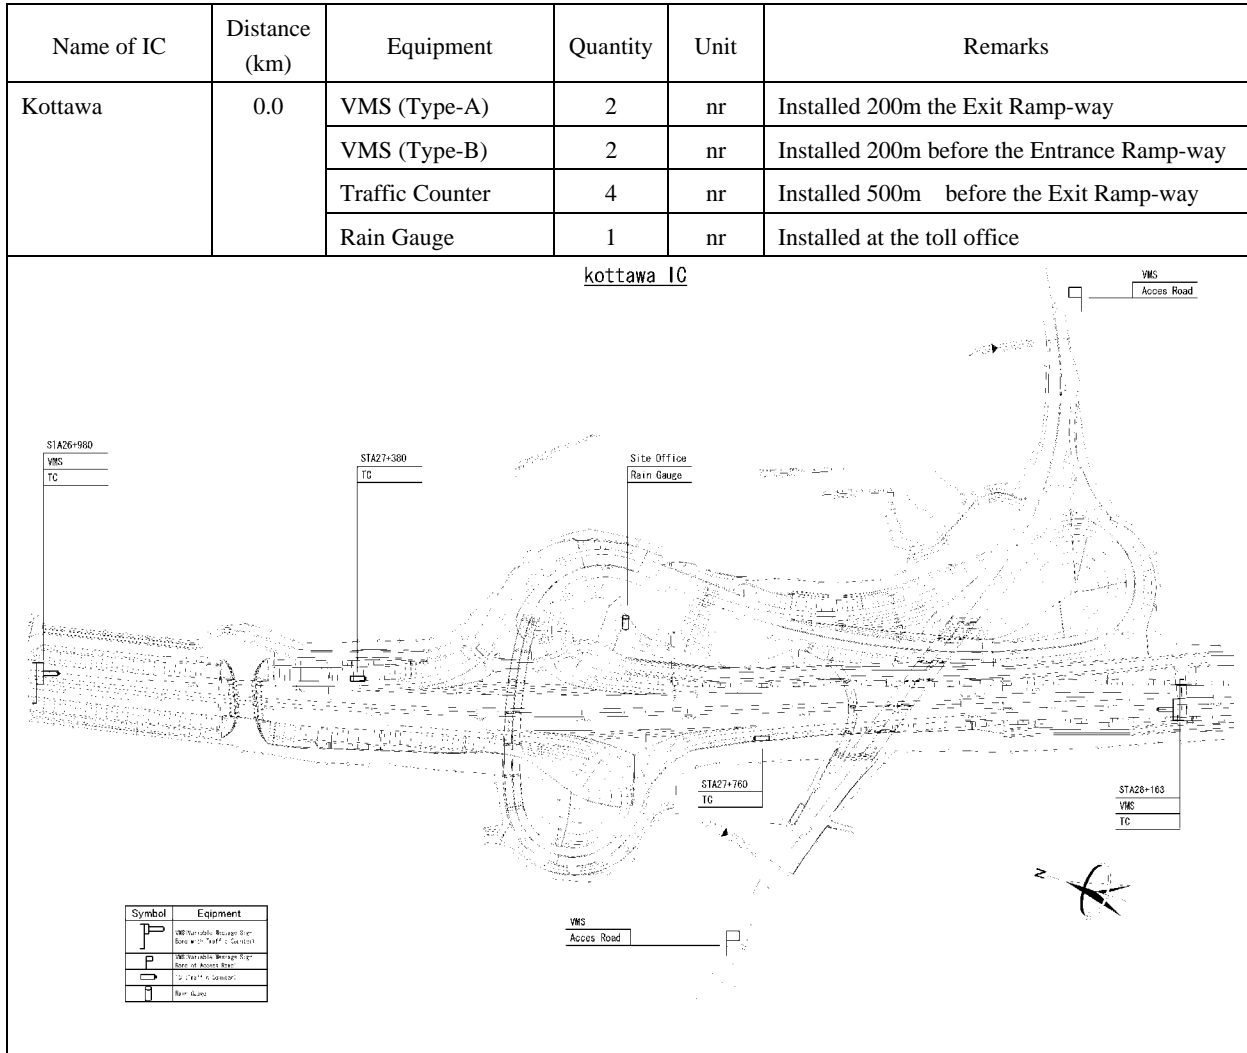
Road side equipment layout plan (Kottawa IC)
